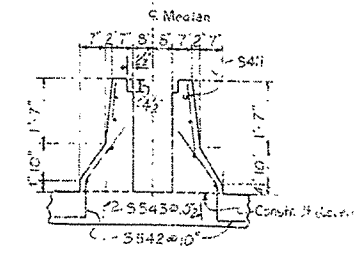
DETAILS OF LONGITUDINAL CONSTRUCTION JOINT
